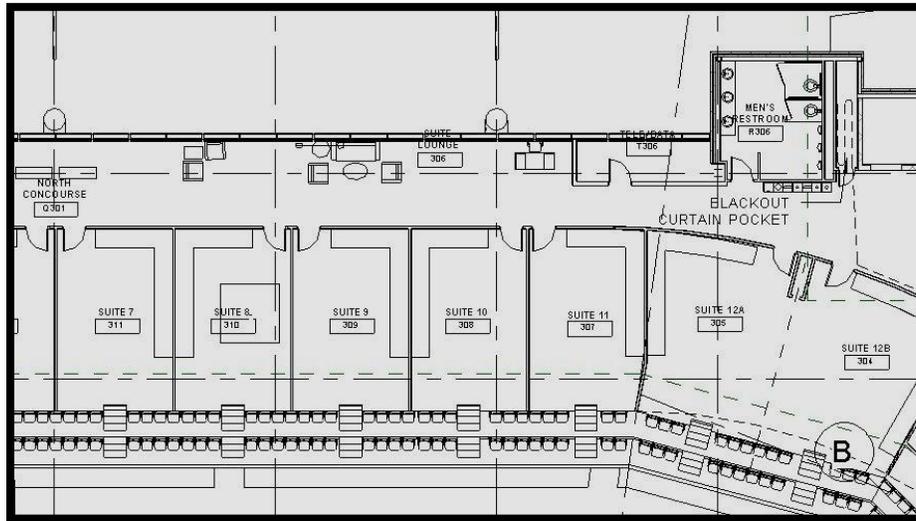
NE Corner of New Club Concourse Level Floor Plan
